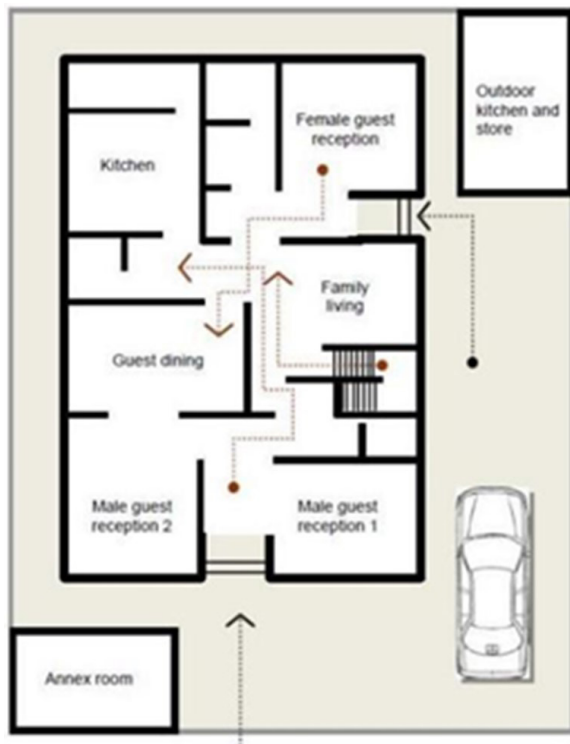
Villa type dwelling: Ground floor plan (Almehrej 2015).
